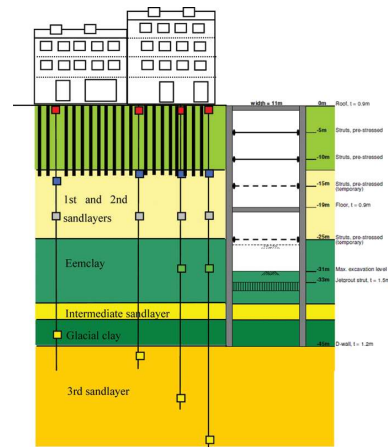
Cross section of Ceintuurbaan station with soil profile and extensometer locations.
